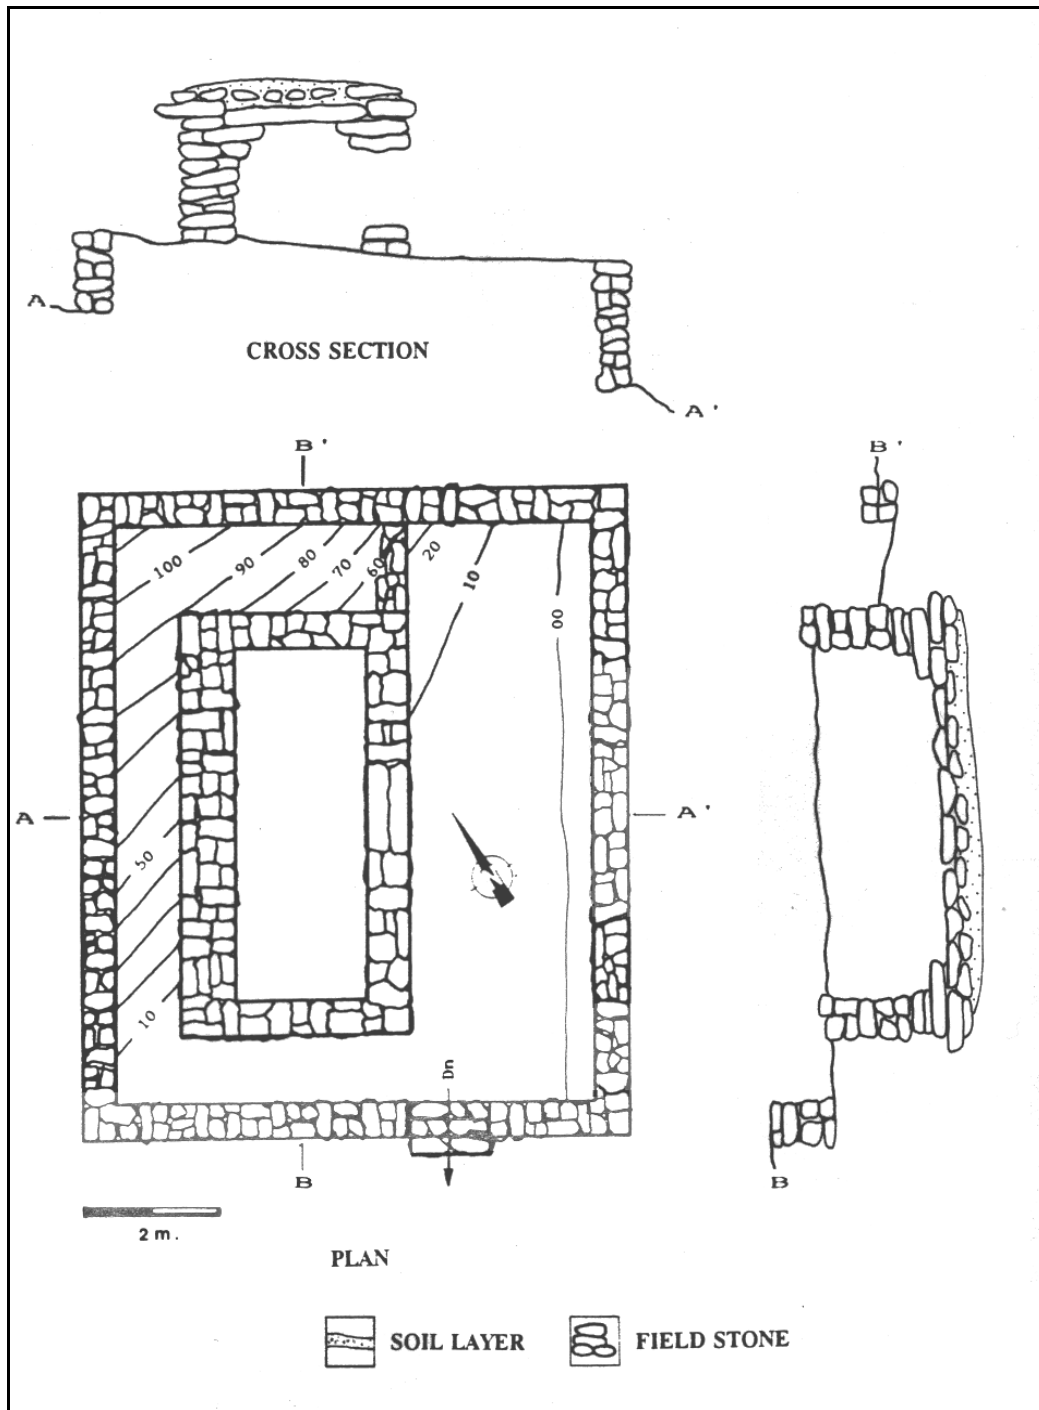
Plan and cross-sections of Tomb 1 (Burial House 1), Quebrada de la Vaca.
